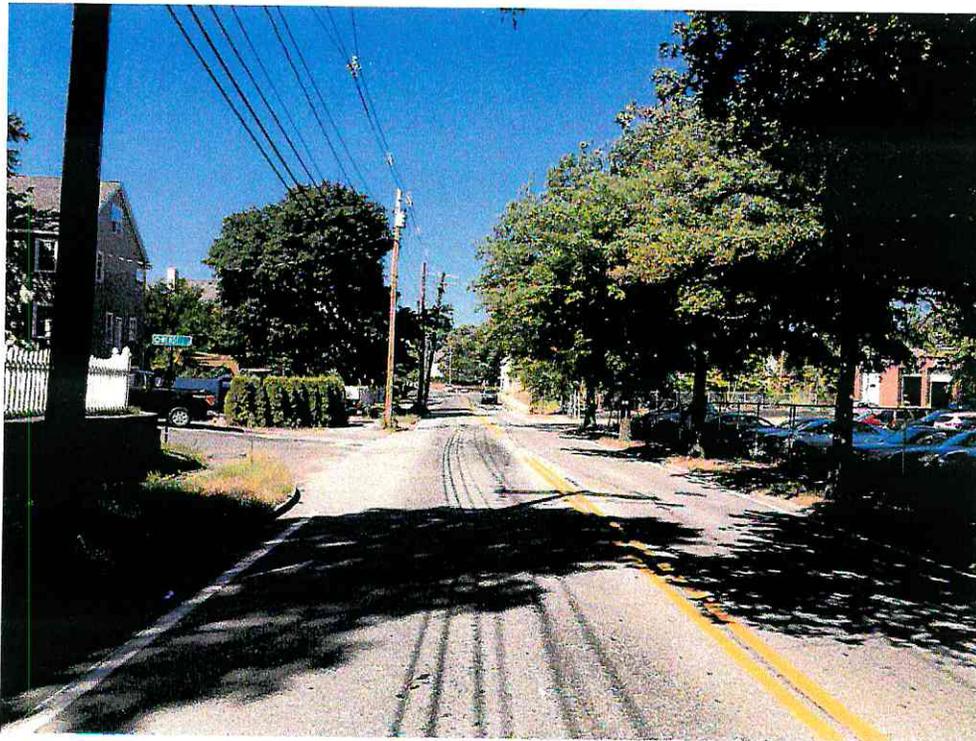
Location a - Cross St. looking west. 85' west of Wendell St.
